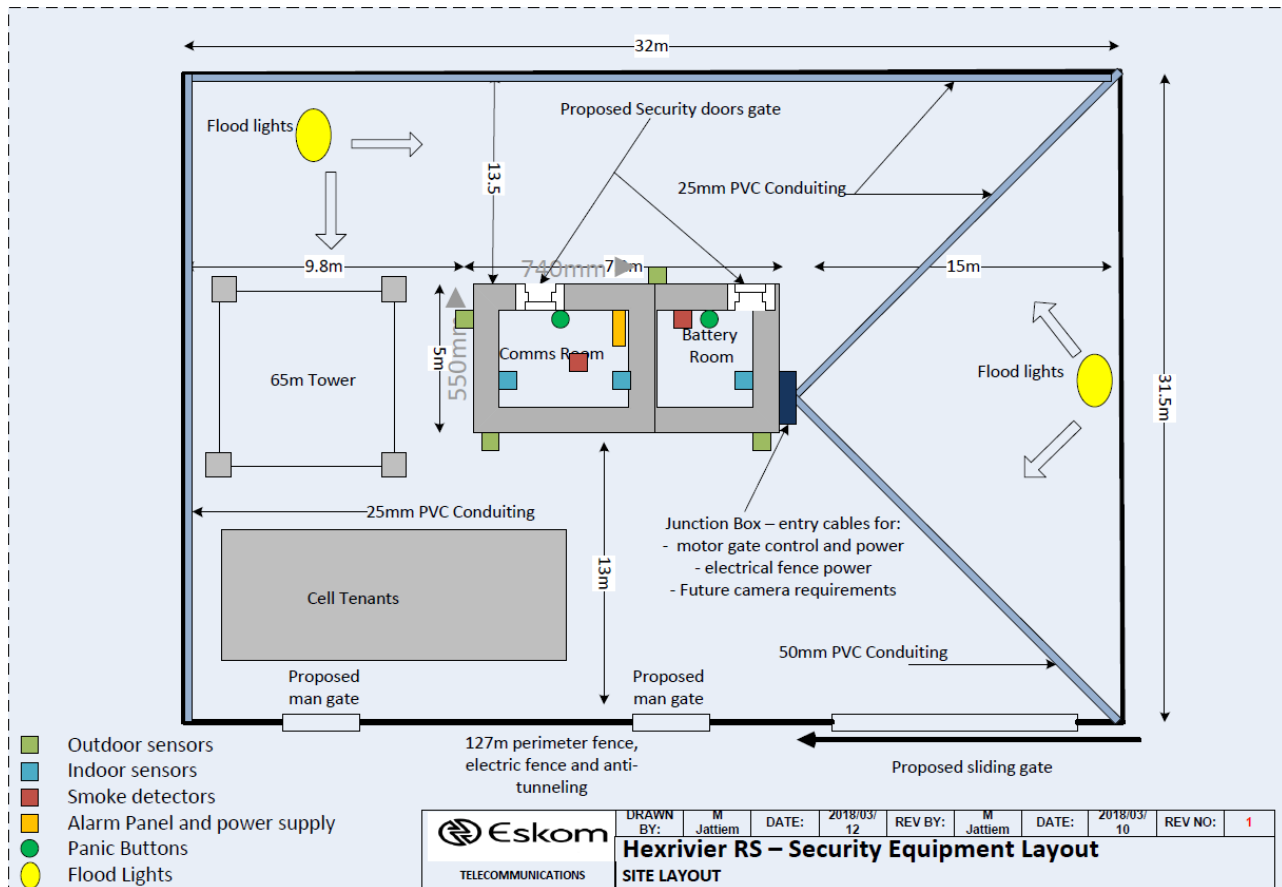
Typical Tx Substation site layout (refer to drawing THE22P02-SE-42)
